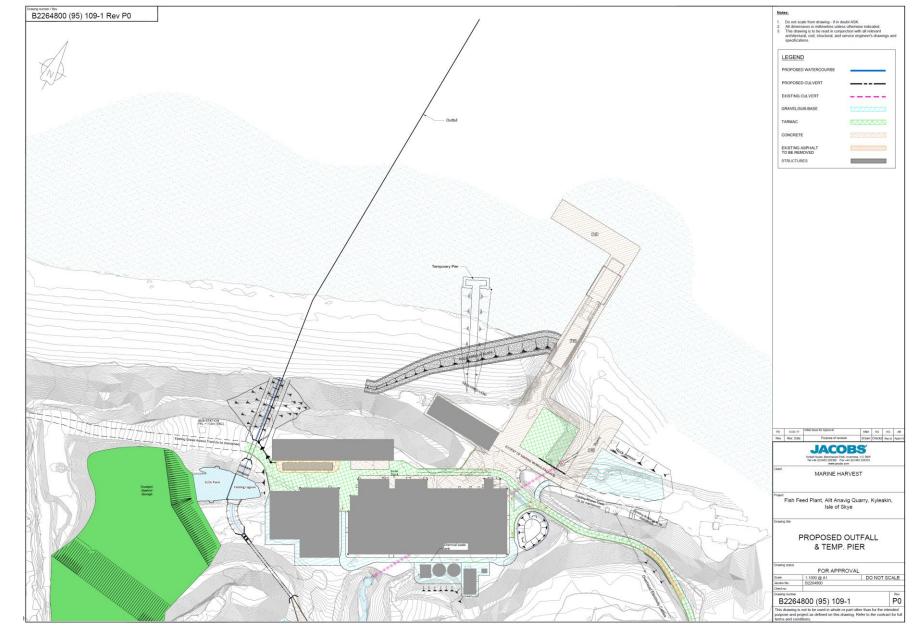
Site layout showing position of temporary jetty and marine outfall.
